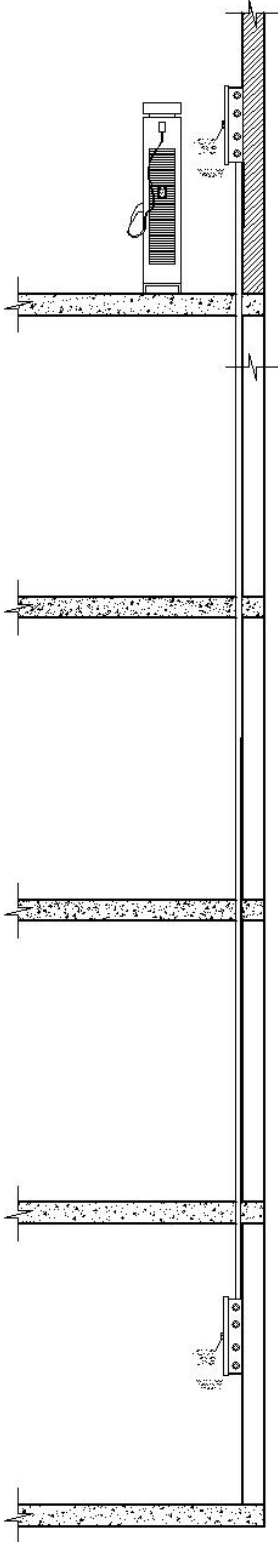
Sectional diagram showing vertical alignment between Level 5 charger location and Level 1 electrical room, illustrating proposed conduit routing path.
